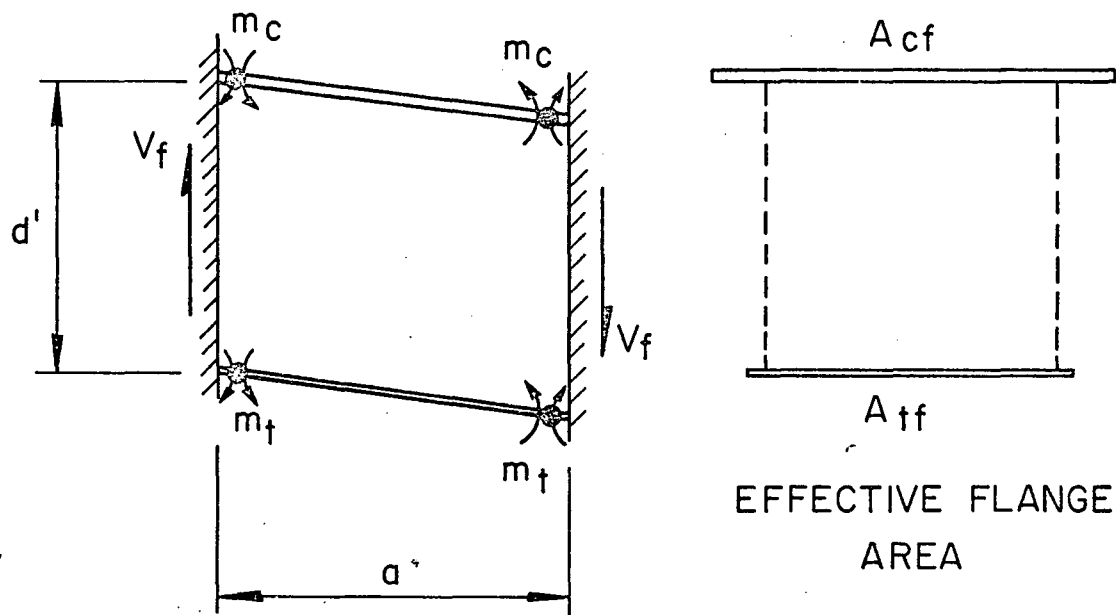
Frame Action Failure Mechanism of Box Girder Flanges
